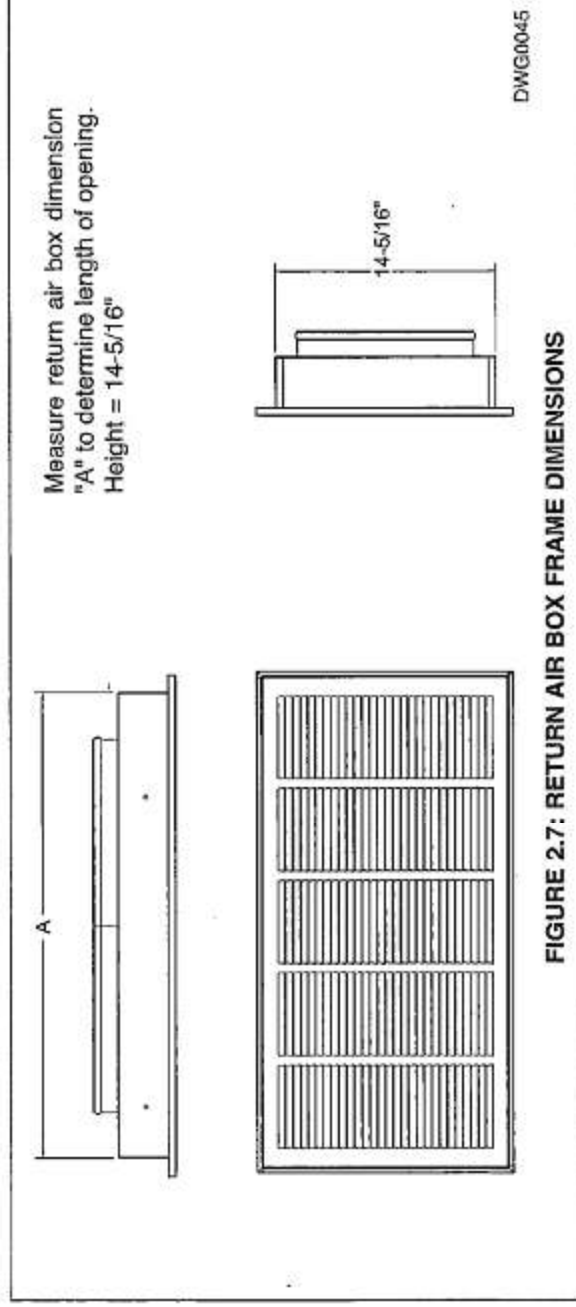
RETURN AIR BOX FRAME DIMENSIONS
